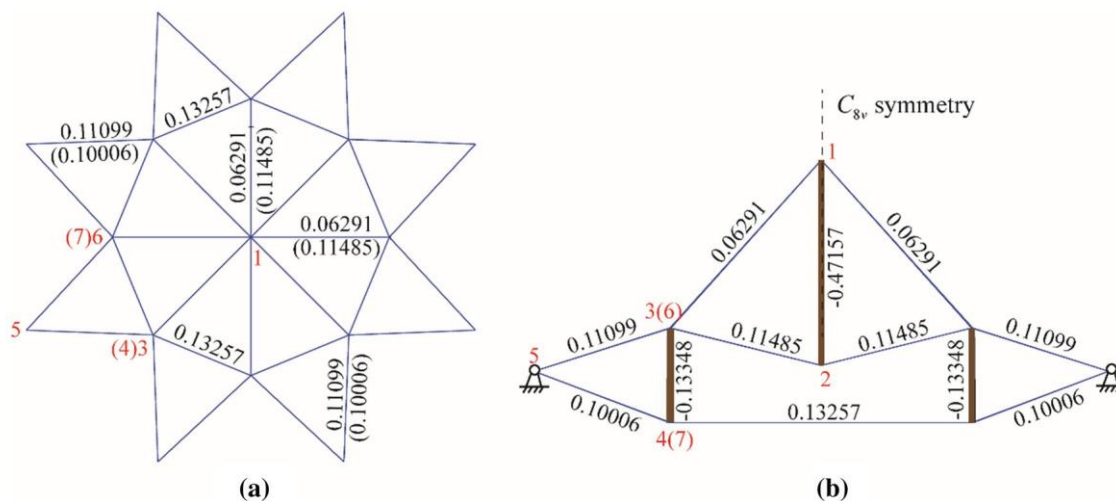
Obtained self-equilibrium configuration and prestress distribution of the Levy cable dome: a plan view; b section view
